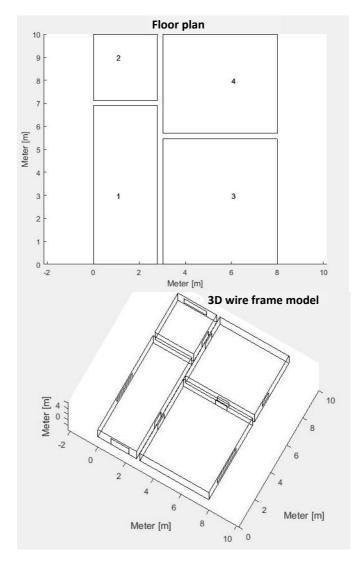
Vertical projection (floor plan) of internal walls with room numbers (top) and 3D wire frame model view in isometric projection (bottom) of the exemplary four-room apartment (case study 1) in the deconstruction planning model The ceiling is assumed to be a timber slab, which is based on the construction type information that was entered by the user and which coincide with the CSV/OBJ information. The roof style is considered a flat roof although further calculations on the ceiling or roof covering from above are not made here. A gross volume or gross area information is not known and thus not entered in the user interface.
